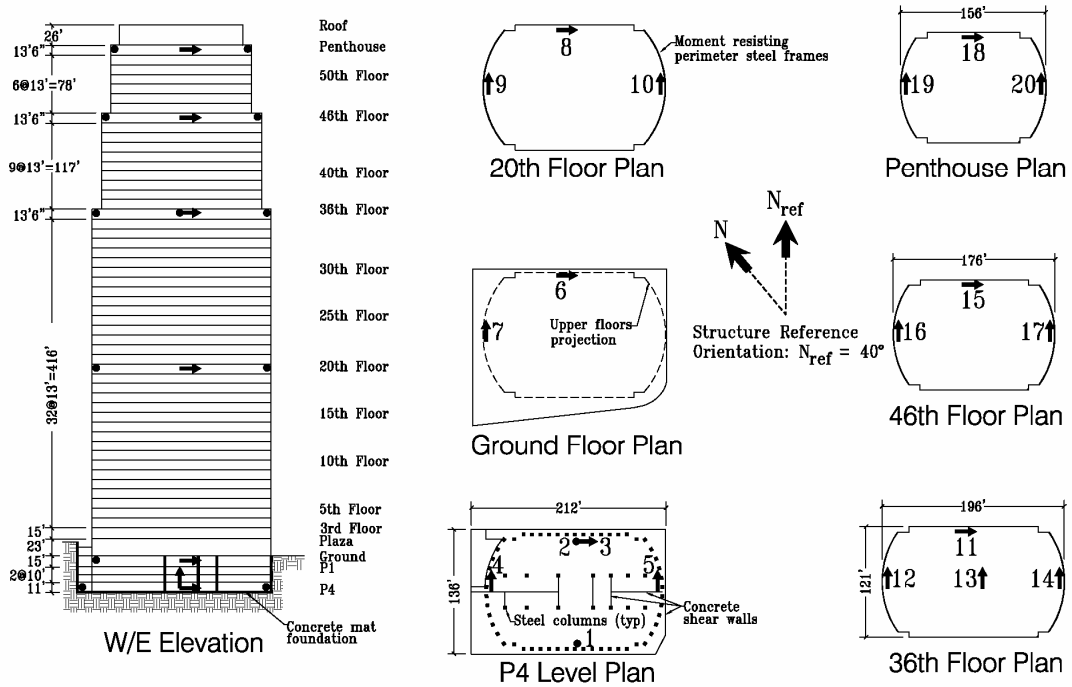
Instrumentation plan of the Los Angeles 54 Story Building
